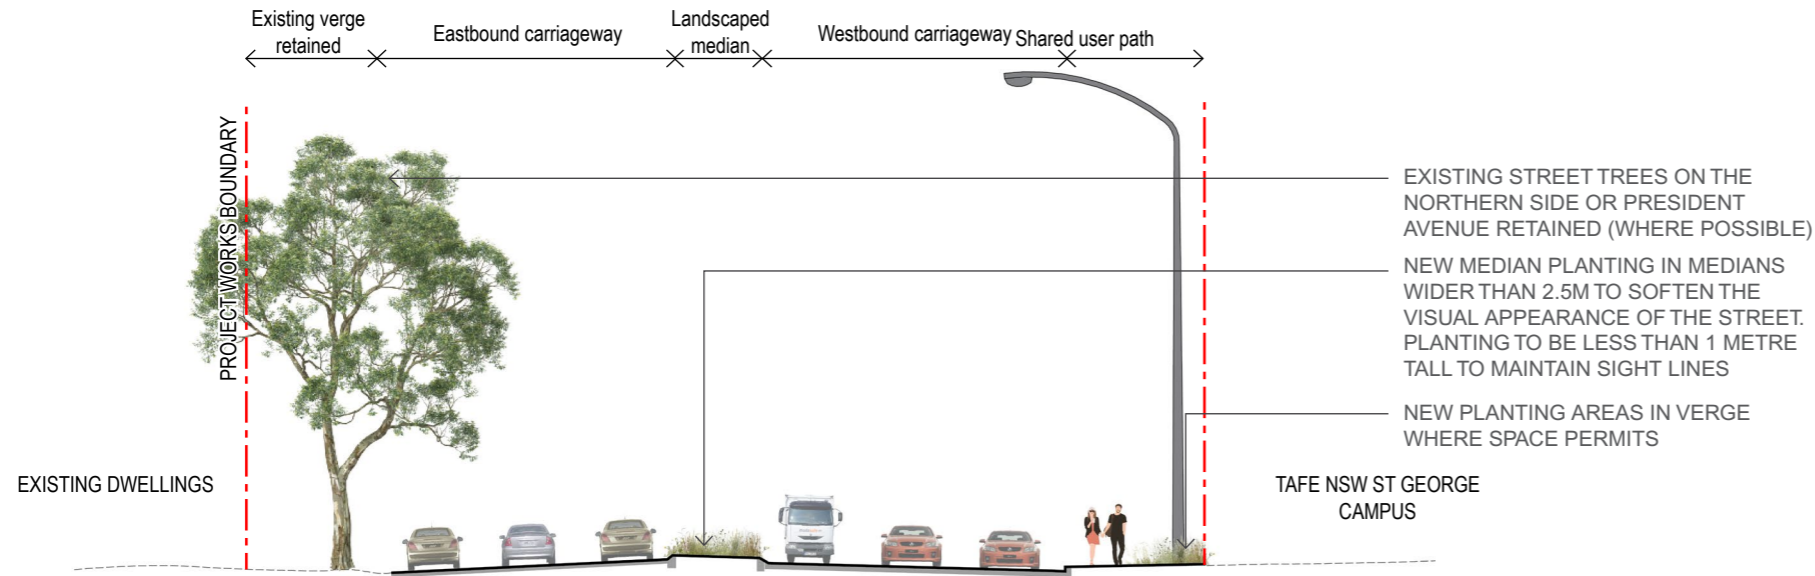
Section 01 - Typical section through President Avenue. Scale 1:200
